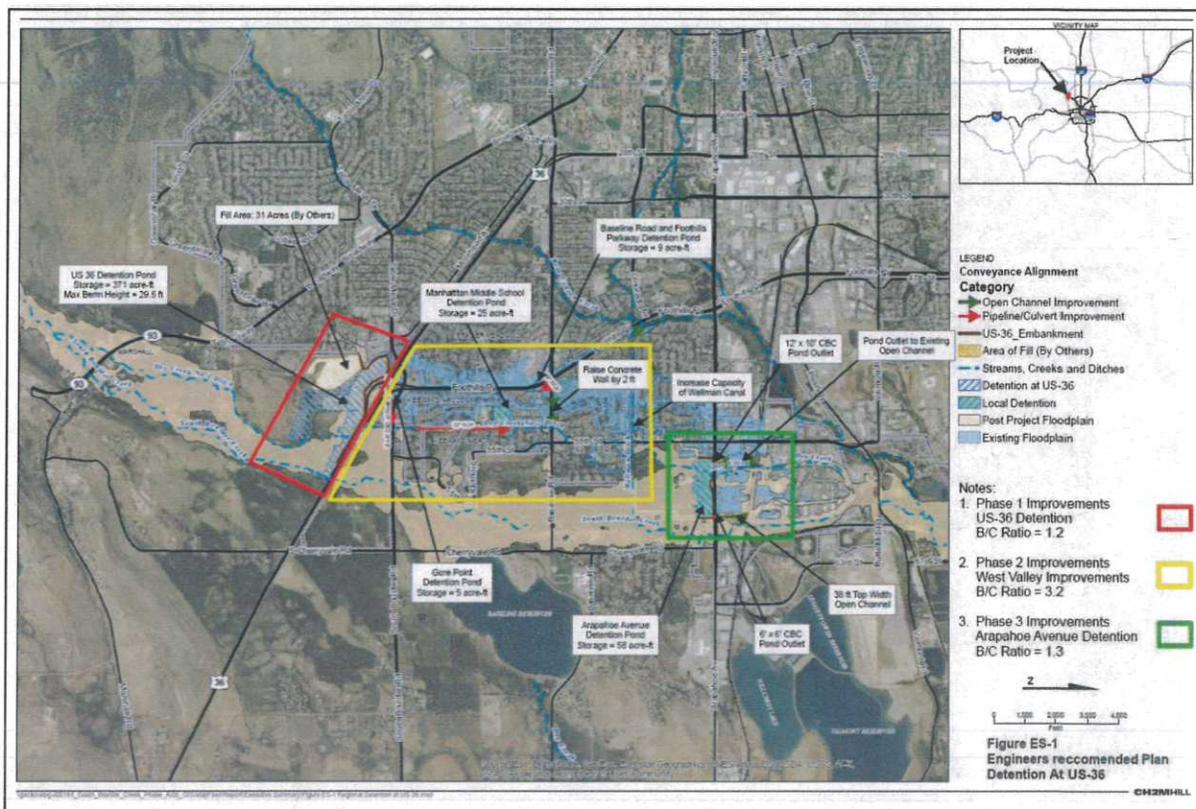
Recommended Flood Mitigation Plan Project Elements
